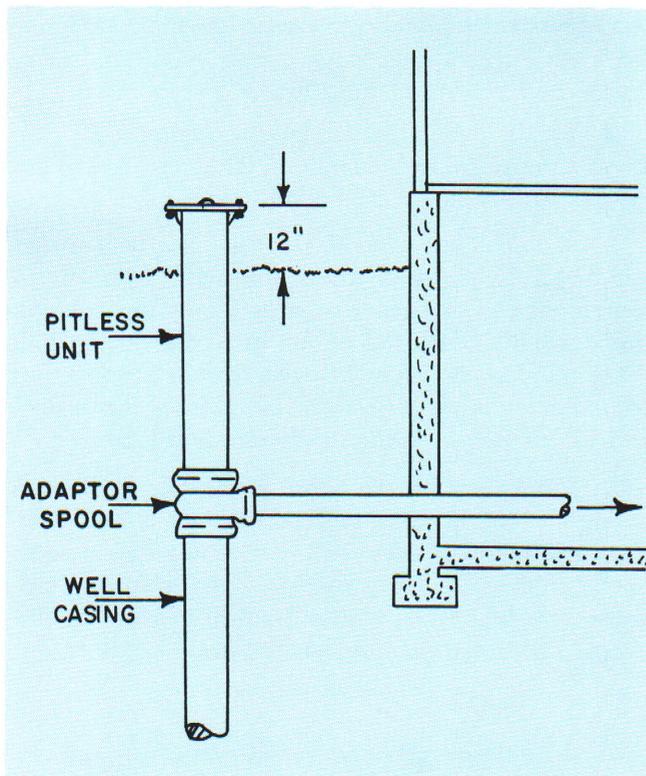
A pitless adaptor must be watertight. All connections must be threaded or welded.
